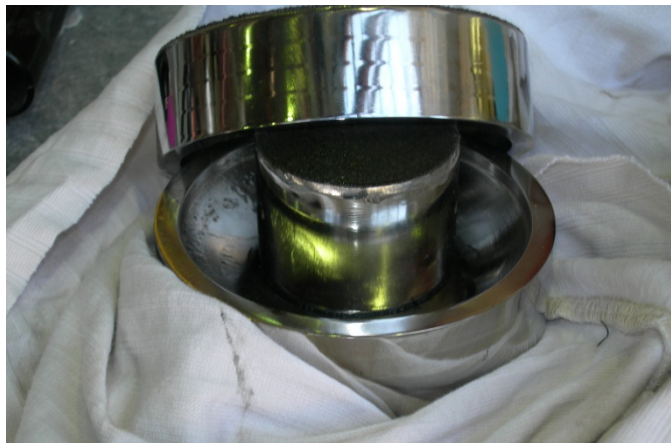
Photograph showing TP inner slider, disassembled for clarification of each component
